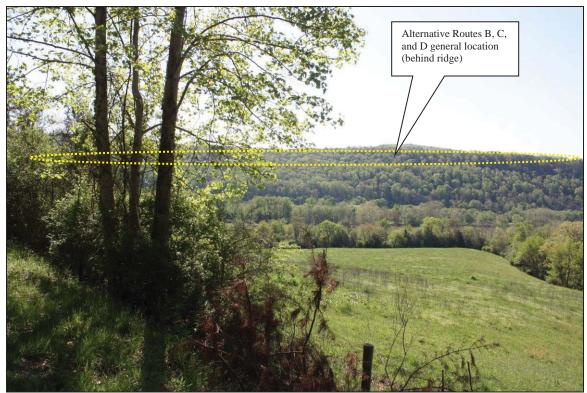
Galts Mill view towards Alternative Routes B, C, and D (Photo location 3), facing southeast.
